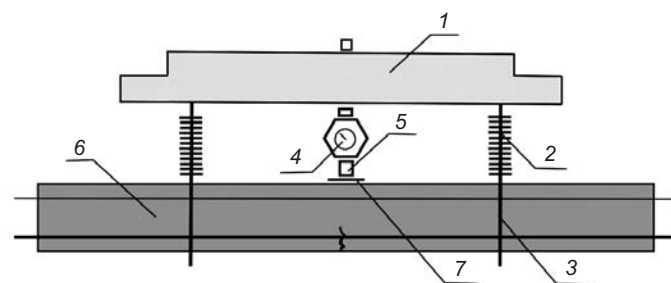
Test element with loading device: 1 - steel beam, 2 - springs, 3 - tie rods, 4 - dynamometer, 5 - roller bearing, 6 - test element, 7 - Teflon washers
